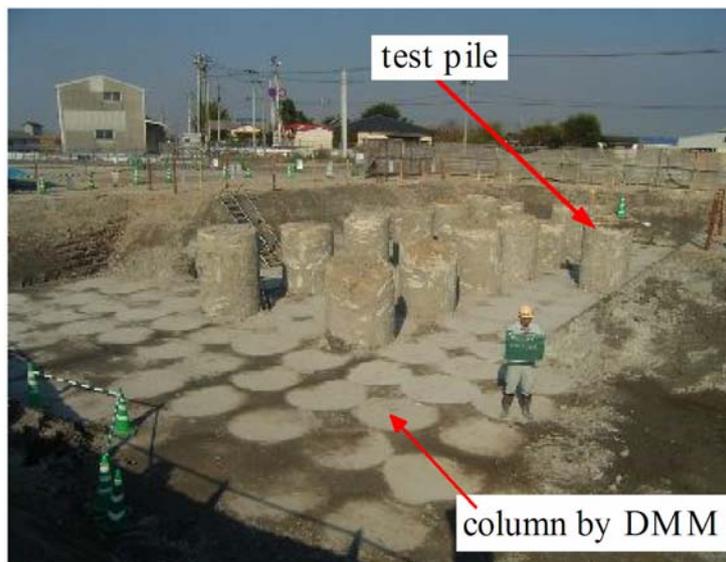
CAST-IN-PLACE PILES IN A COMPOSITE GROUND FOUNDATION
